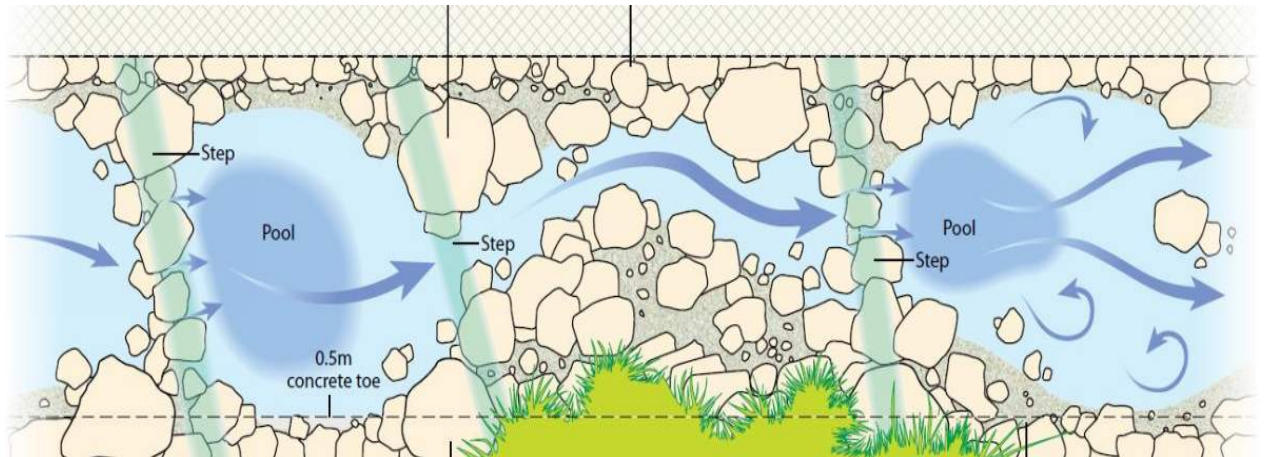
Plan of Proposed Typical Step Pool Arrangement
